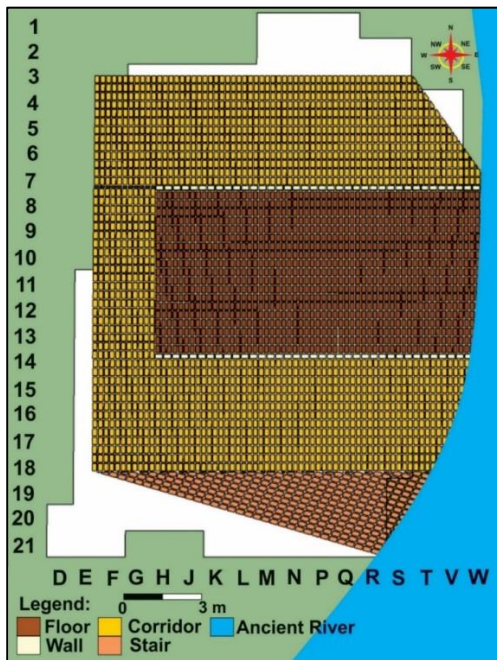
The SB2J site's proposed reconstruction architecture plan reveals that an ancient river served as the foundation for the main building structure
